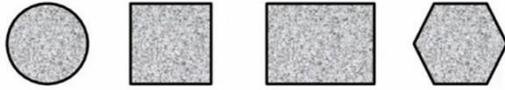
Sections of Concrete Filled Steel Tubular (CFST) column cross-sections
